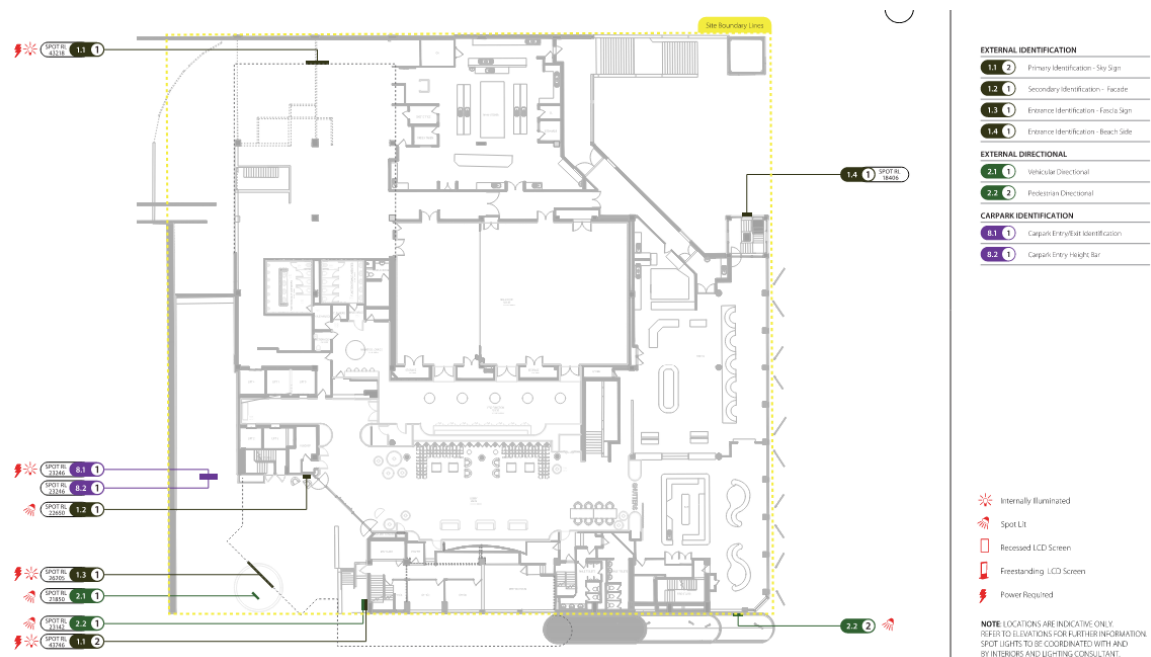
Proposed Signage Location Plan (Source: Corlette)
